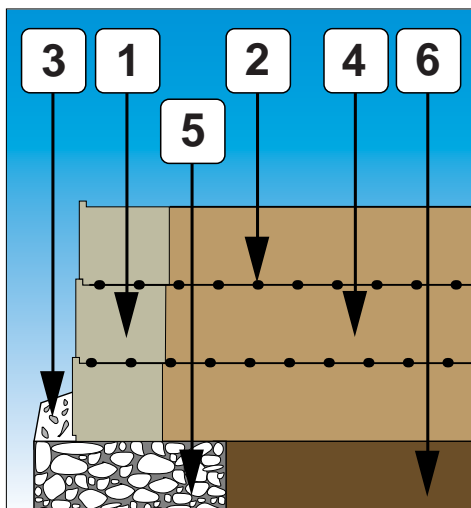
The TENAX NURAGHE segmental retaining wall System.
